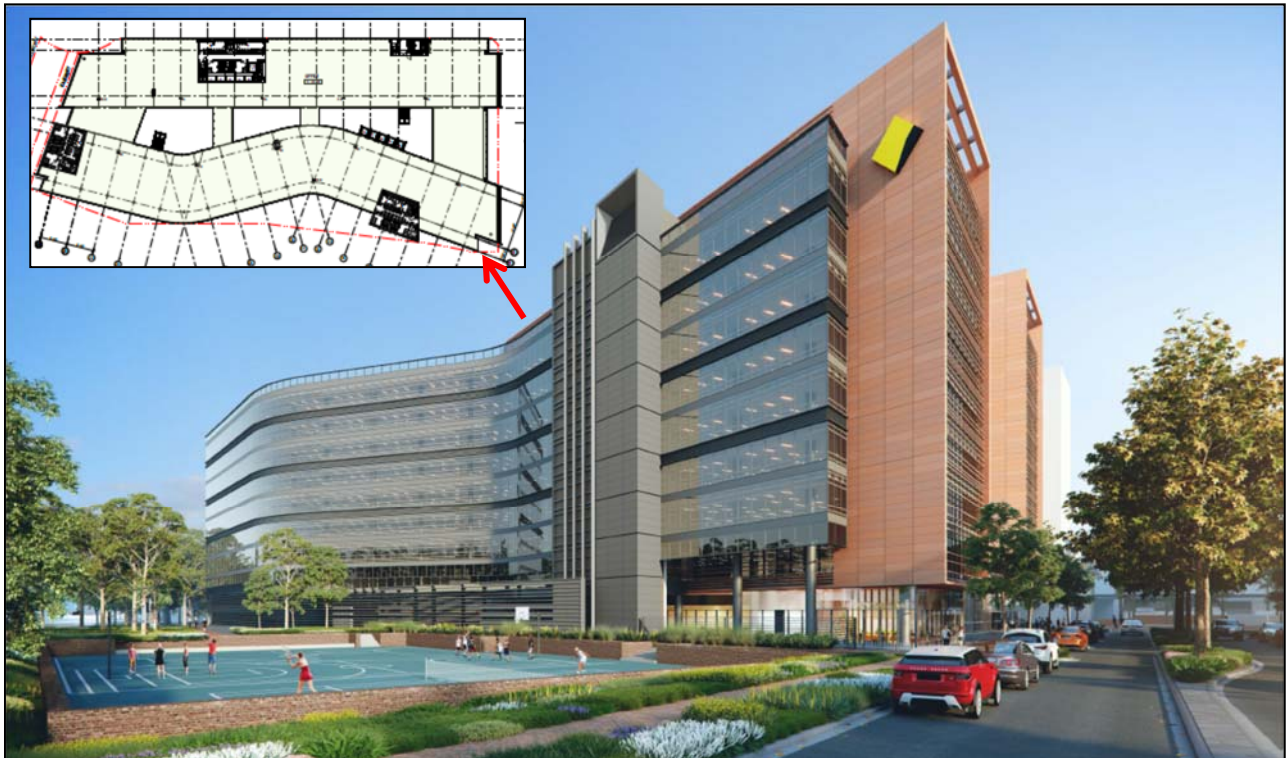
Photomontage of Building 1 showing the southern elevation and inset showing typical commercial level floor plan (Source: applicant's EIS)
